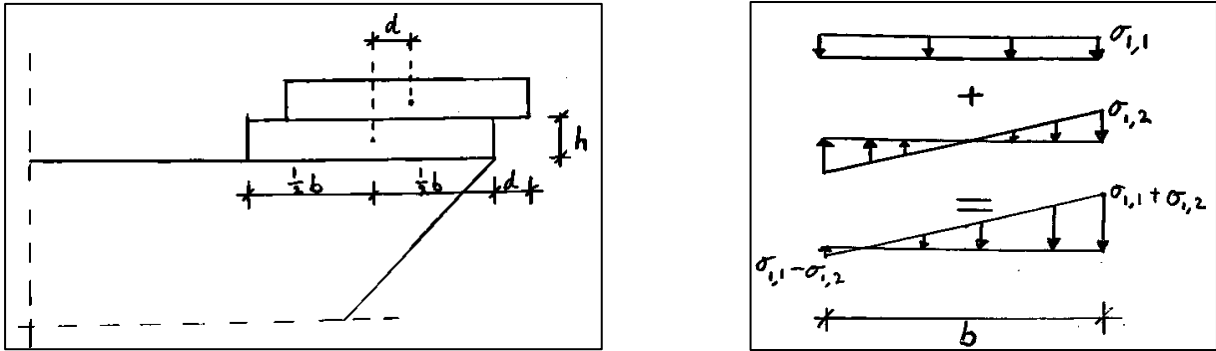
First printed layers of concrete at the prefab element (left) and stresses in lowest printed layer due to a layer on top.
